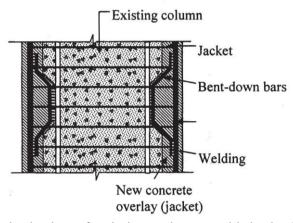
Jacketing of existing columns with jacketing with new concrete and additional steel
